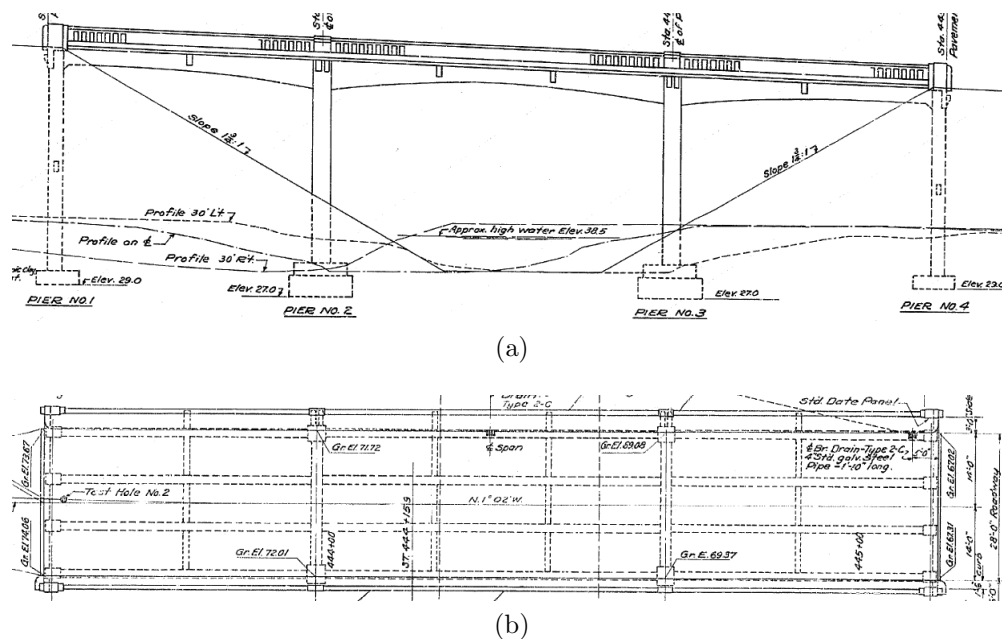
Bridge 1 in (a) elevation and (b) plan view
